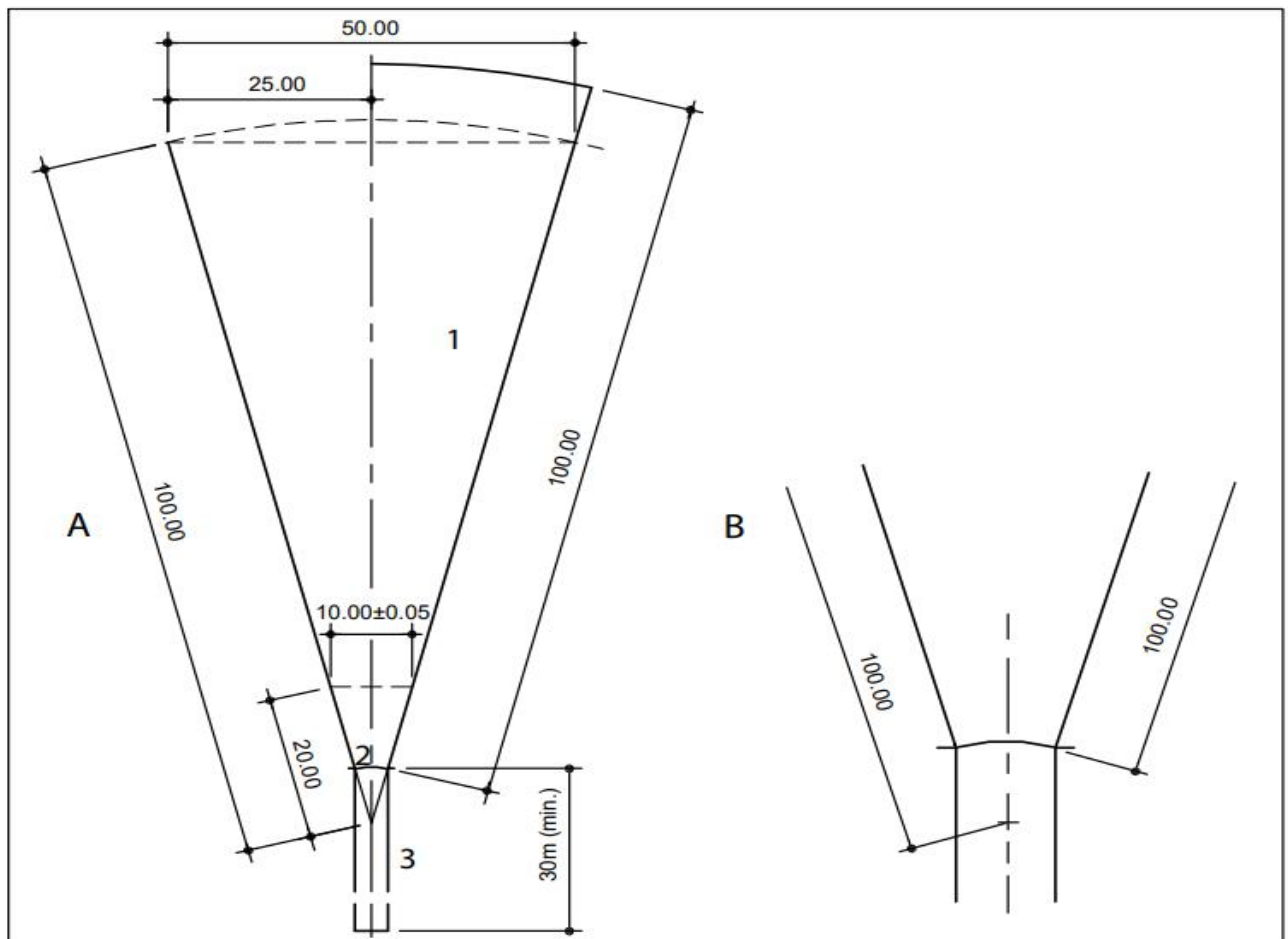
Javelin Throw facility (Dimensions in m)
